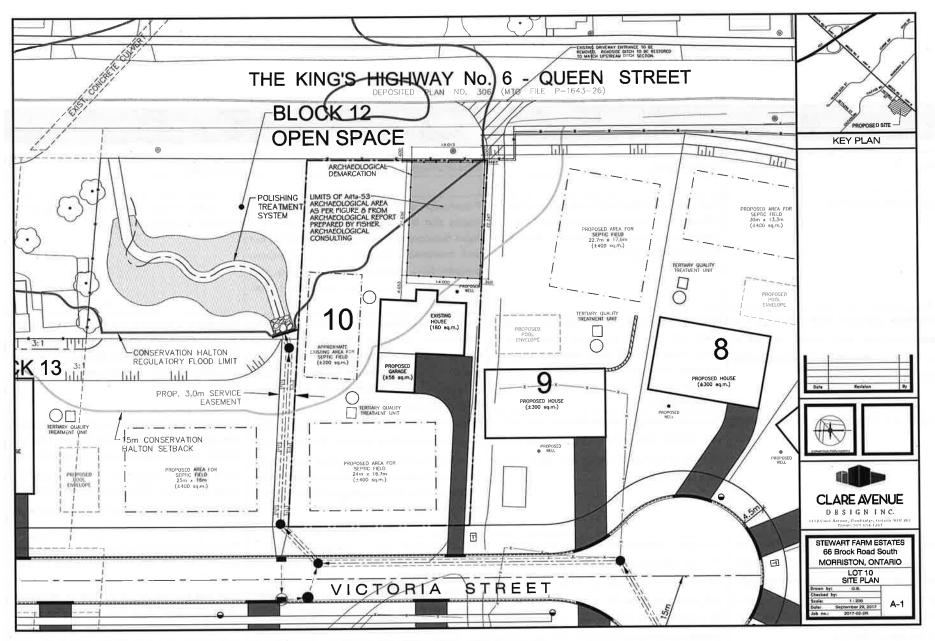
Proposed Site Plan for Lot 10, by AMEC
